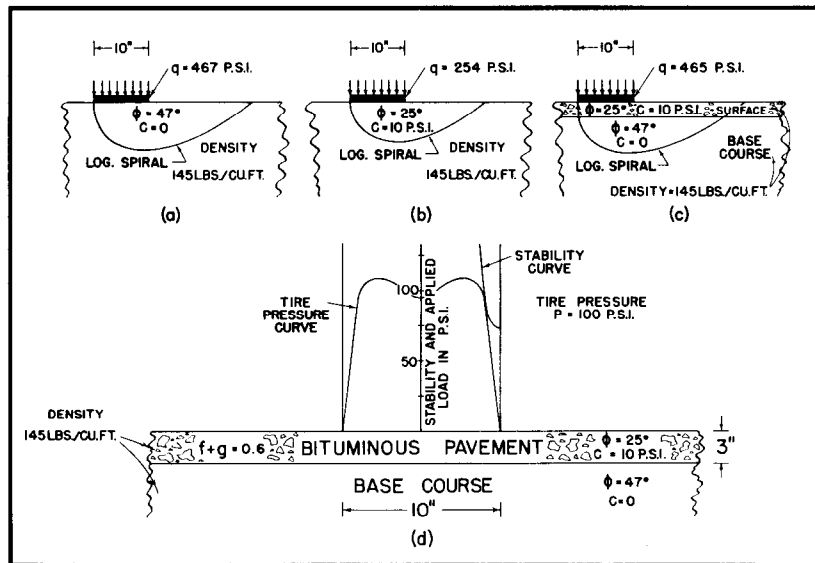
Illustrating Failure Criteria For Flexible Pavements.
